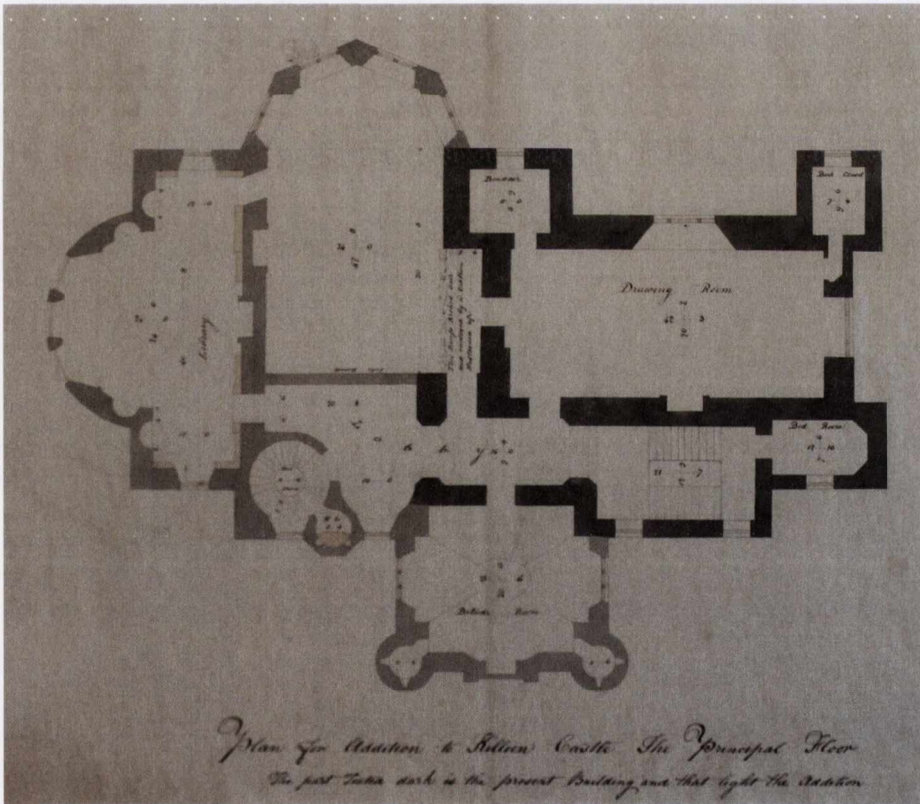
Killeen Castle, proposal first scheme, principal floor plan, Francis Johnston, [Jan. 1802], IAA, RIAI Murray Collection, 92/46.896, courtesy of the Irish Architectural Archive.
